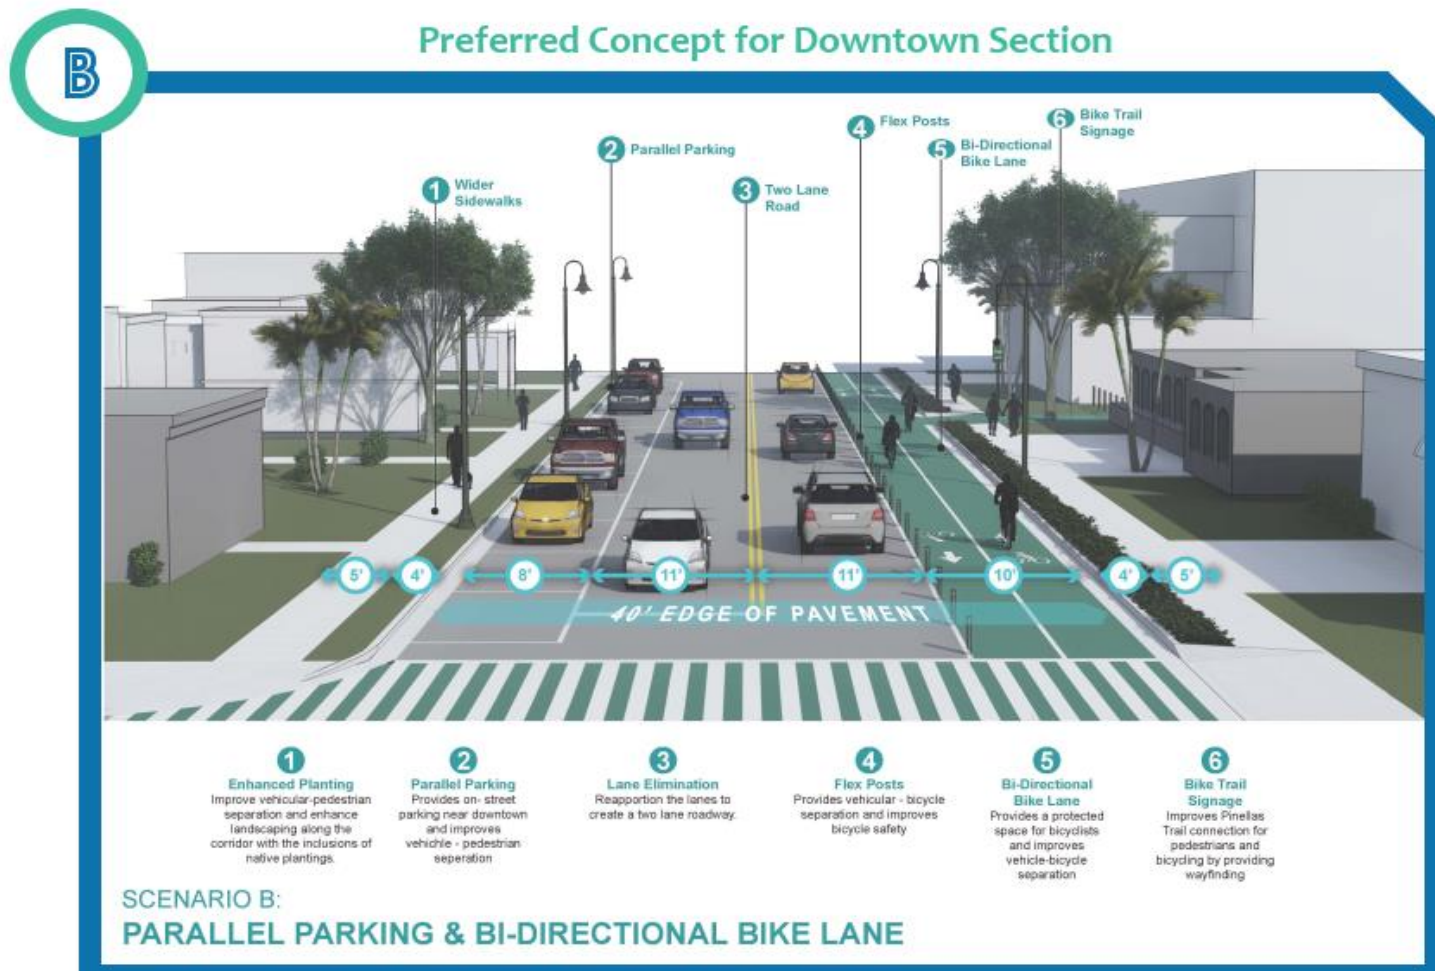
Drew Street from North Myrtle Avenue to North Keene Road (Segment 2)
